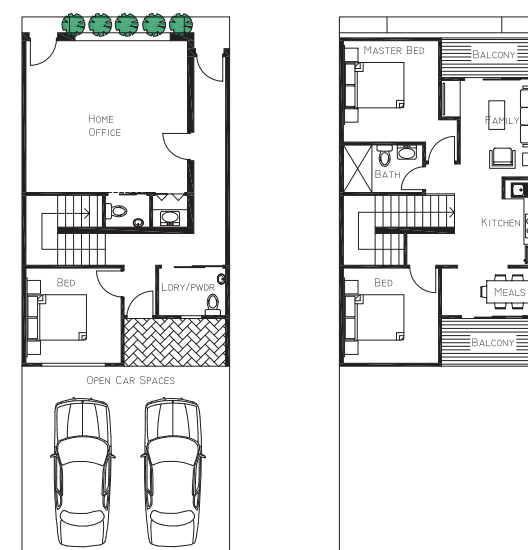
Indicative Floor Plan of SoHo [open parking arrangement]
